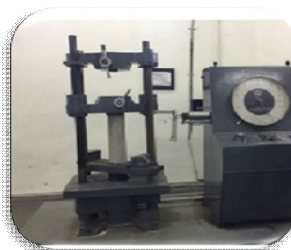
Preparation of CSGN & CSGS Concrete Column
